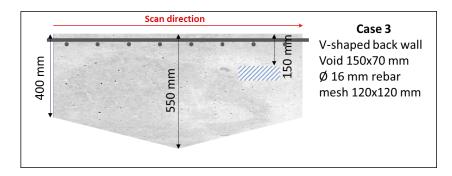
Concrete block with a V-shaped back wall, rebar mesh, and a void
